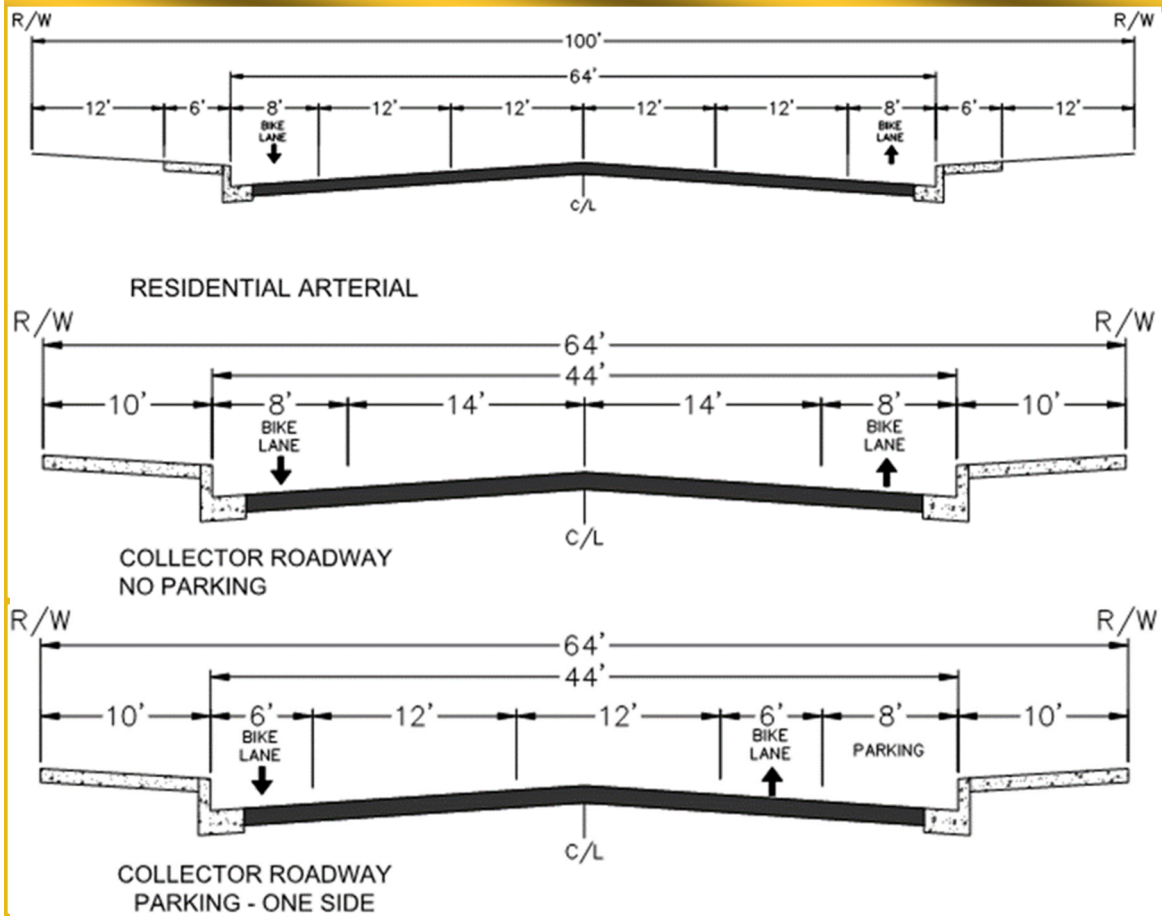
Retrofit Street Sections For Existing Development
